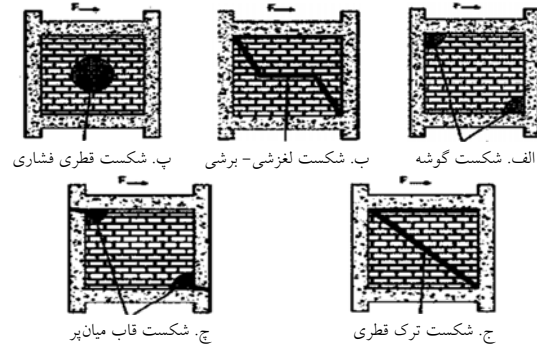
Different failure modes of infill-frame masonry [19].
